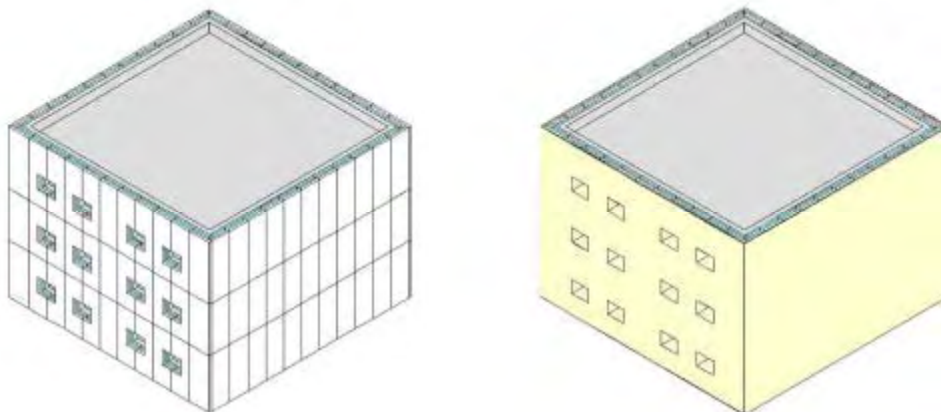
Model House Structure 1 – Cast Concrete Walls and Insulation
